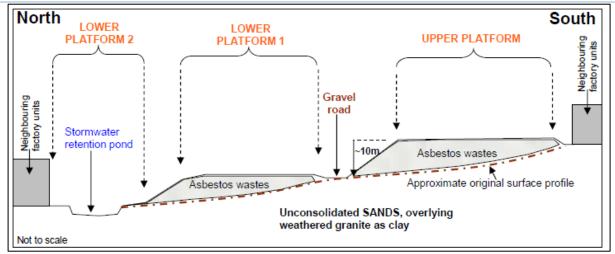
NORTH-SOUTH CROSS SECTION OF THE ASBESTOS WASTE CONSOLIDATION AREA (SOURCE: MEGA GEOTECHNICAL ASSESSMENT, 2011)
